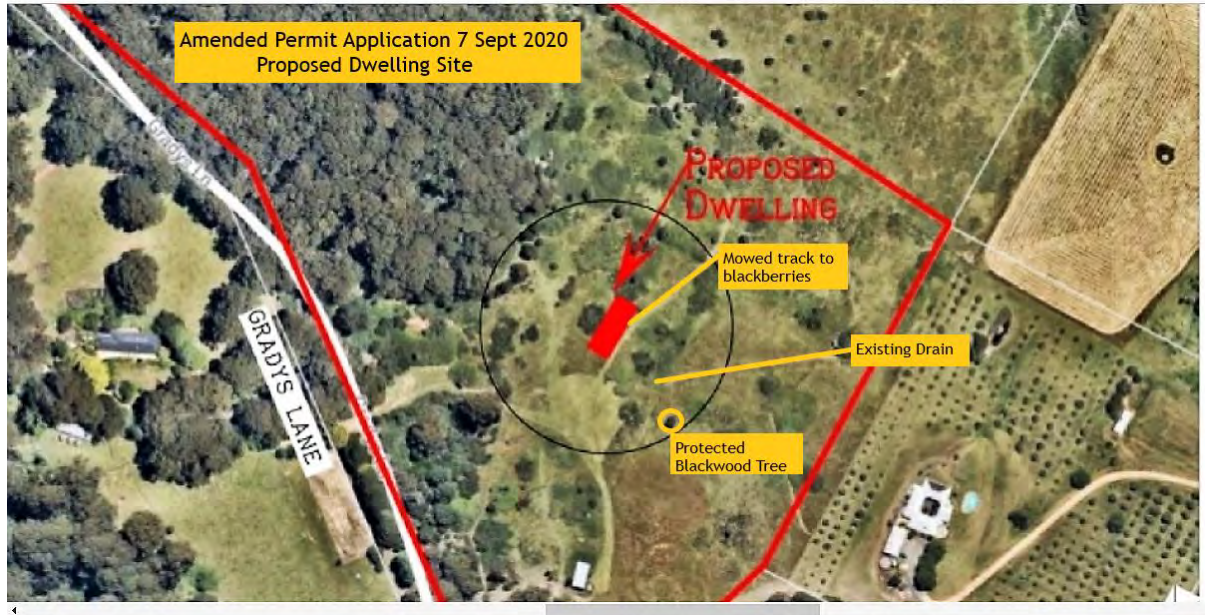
Permit Appendix 9-Driveway Layout Note: Dwelling now 10-15m further East?
